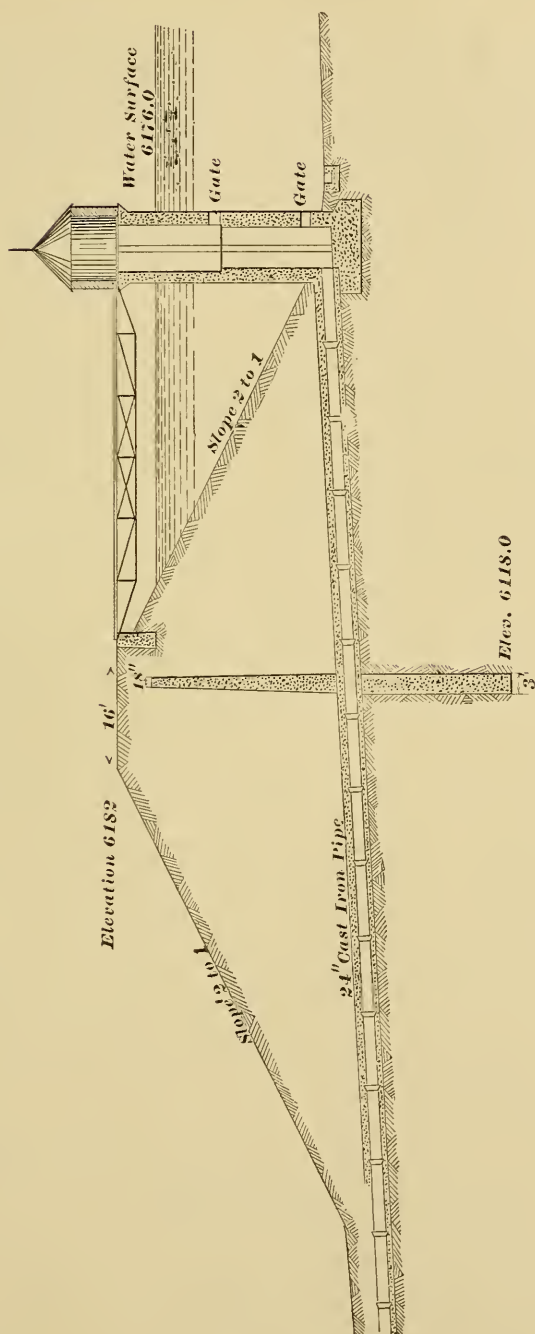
SOUTH FORK RESERVOIR. SECTION OF DAM.
